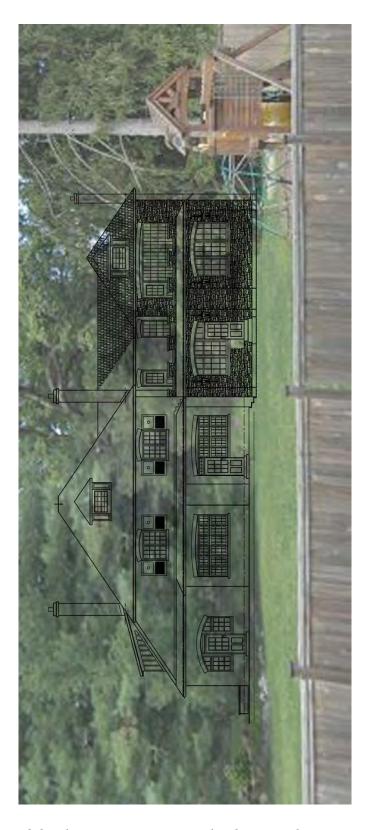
Proposed development set in current landscape. The property is too large to incorporate adjacent structures into a single image. (Image from owners.)
